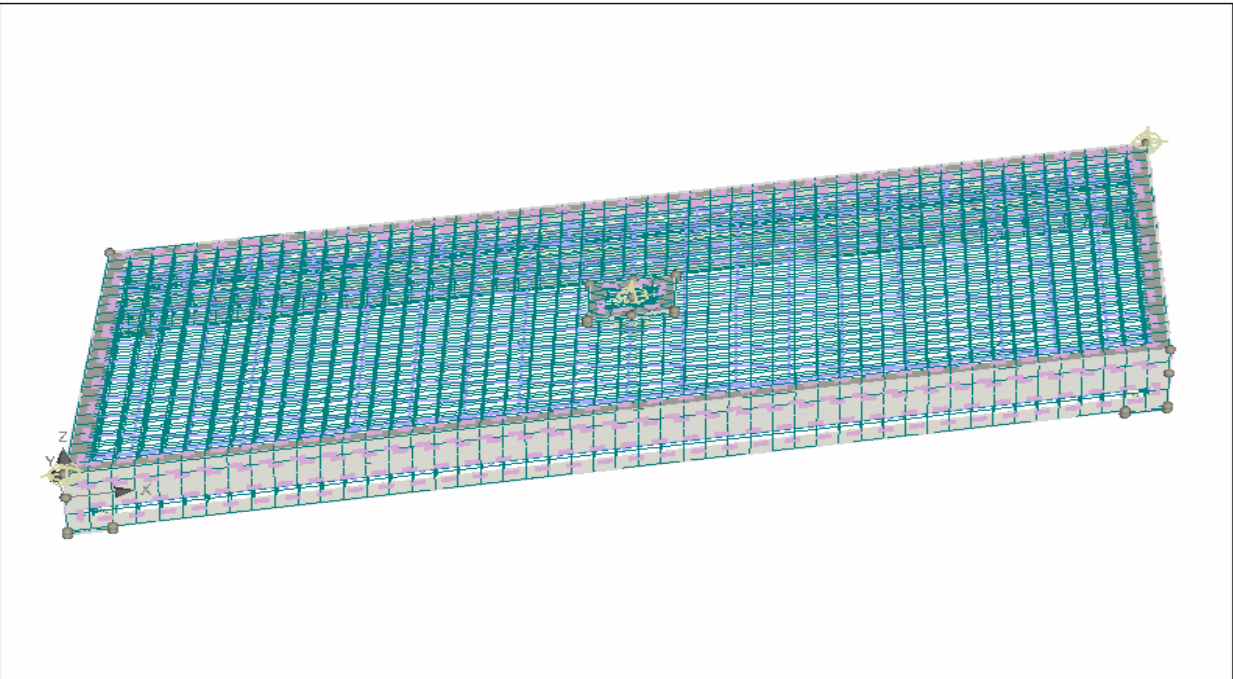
, Modelling of skew slab specimen 1 with edge beam
